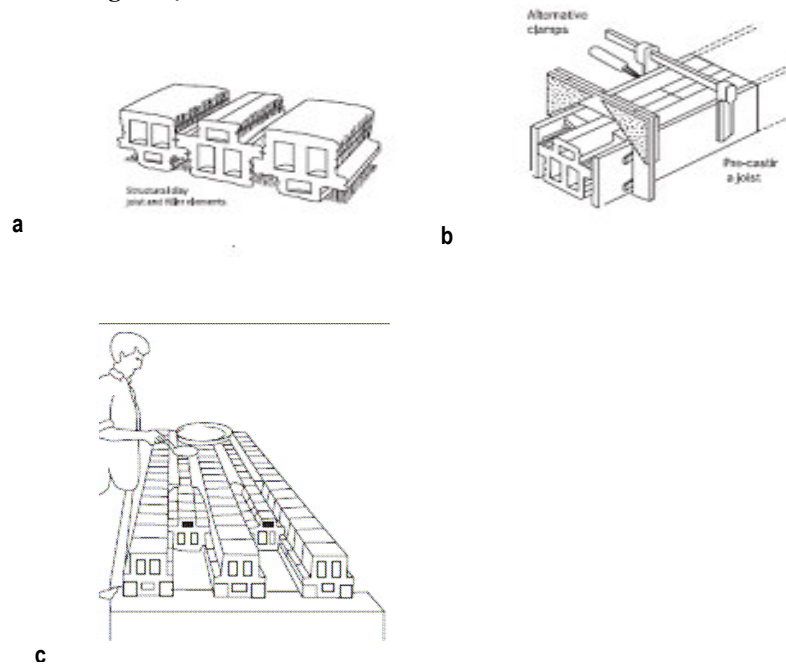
Extruded cultural clay-joist and filter unit floor/roof
